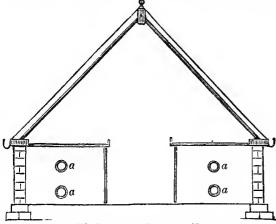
SECTION OF SPAN-ROOF HOUSE. a a a a, Hot-water Pipes for Bottom Heat.
